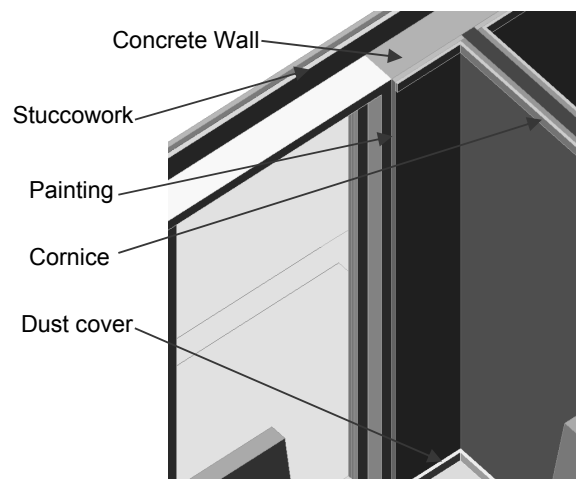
Detailed of a typical floor (Detail A Figure 1)
